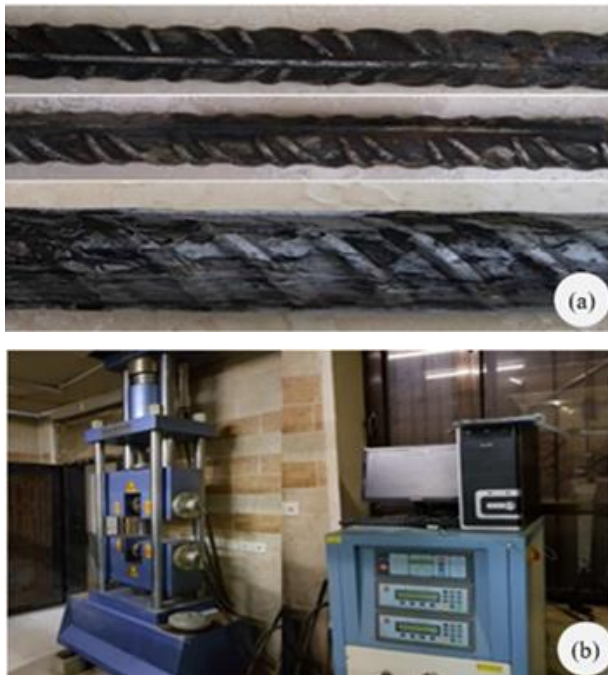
(a) Cleaned specimens from rust and corrosion products, (b) The machine used for tensile testing.
